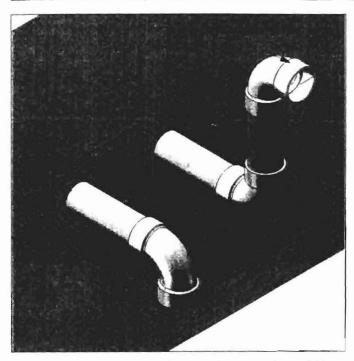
Direct Vent - Sidewall Termination of Vent and Combustion Air Piping
